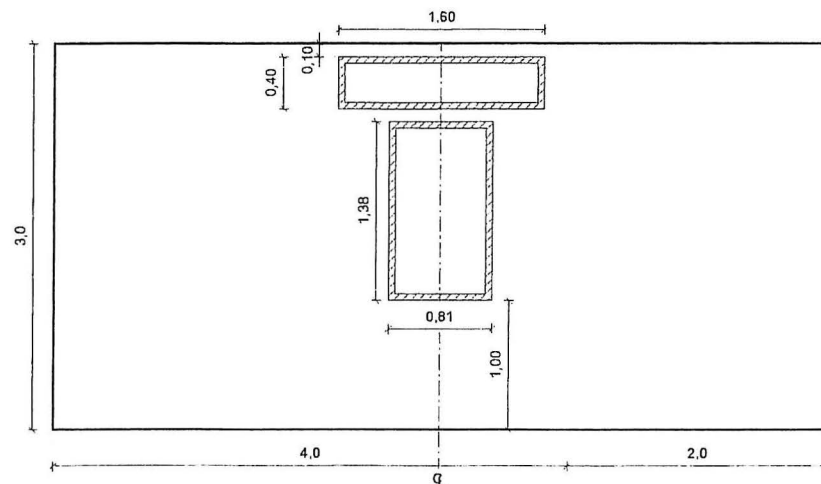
The bottom hung window is mounted in the insulated wall 10 cm below the ceiling. Another window is also mounted in the wall for other purposes.
